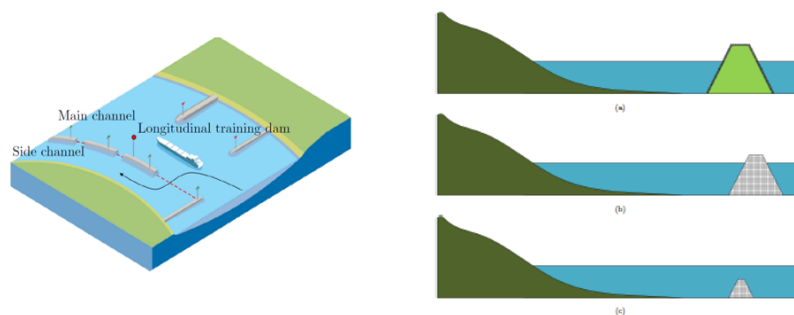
Sketch of Longitudinal Training Walls (left) and cross sections of the longitudinal training structure (right a) and emerged and submerged sill (b and c) – [Jammers (2017)]
